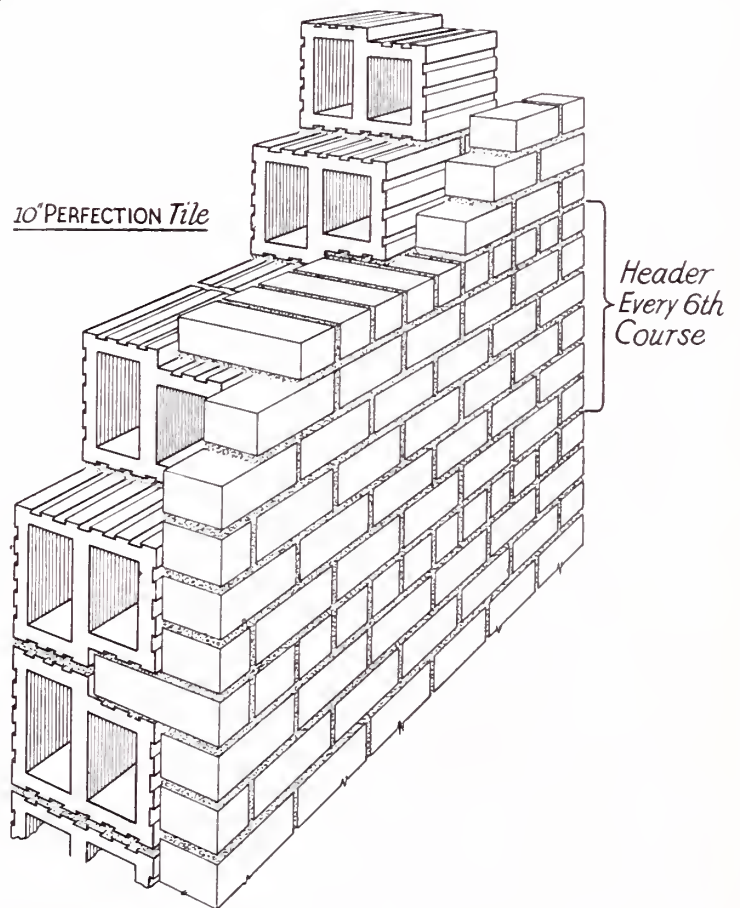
Section of fourteen-inch load bearing wall with brick veneer, backed with ten-inch PERFECTION BLOCK.
